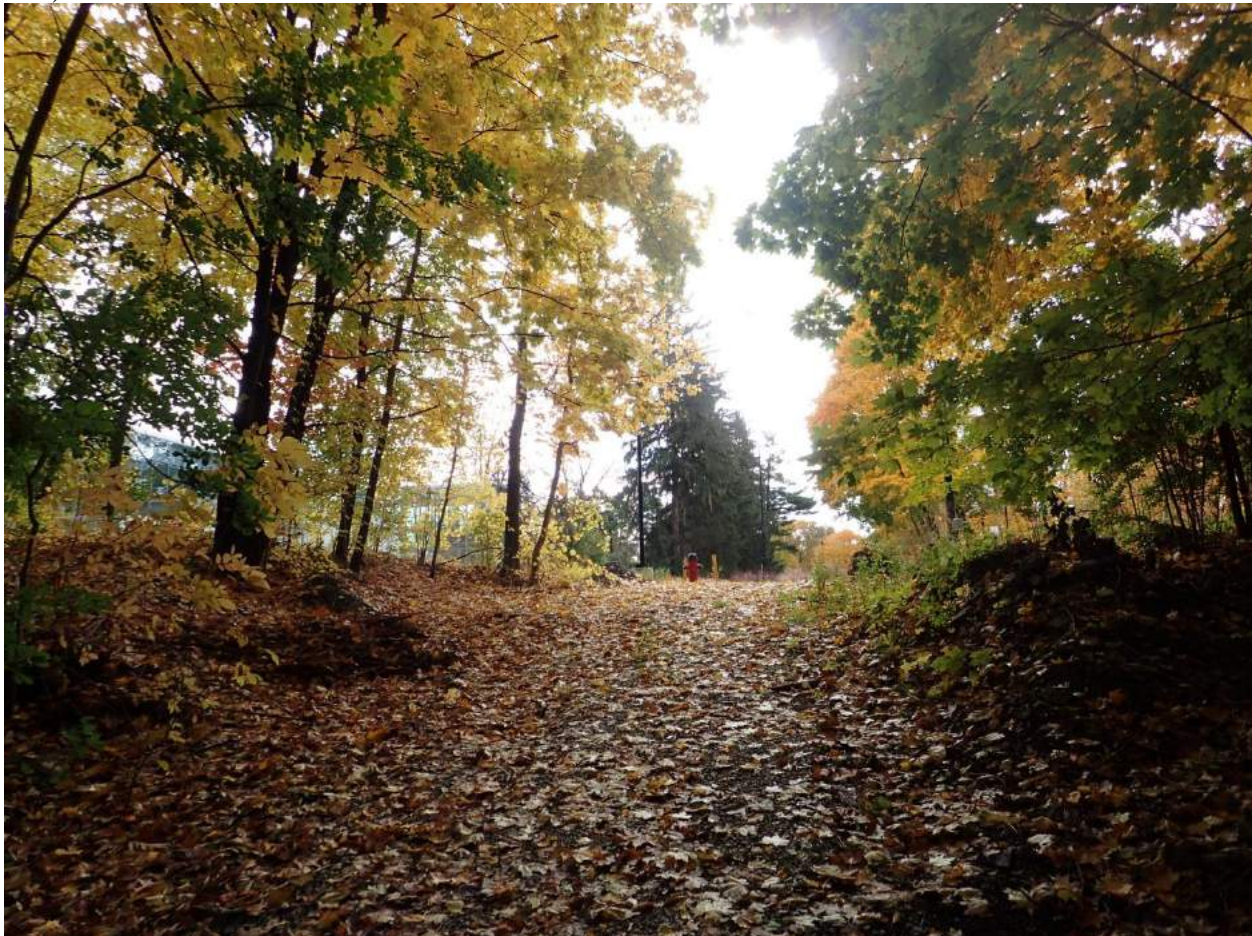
Existing Unpaved Access Road at Proposed Infrastructure Works
